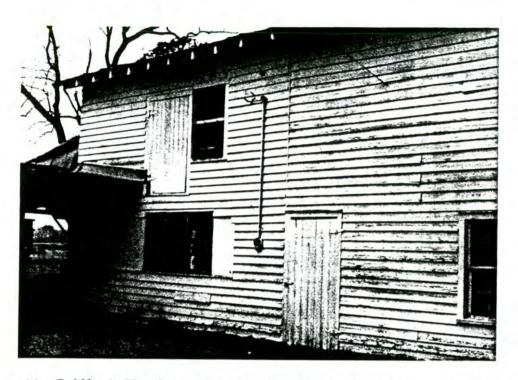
Griffen's Hatchery, showing first floor original door, south elevation
